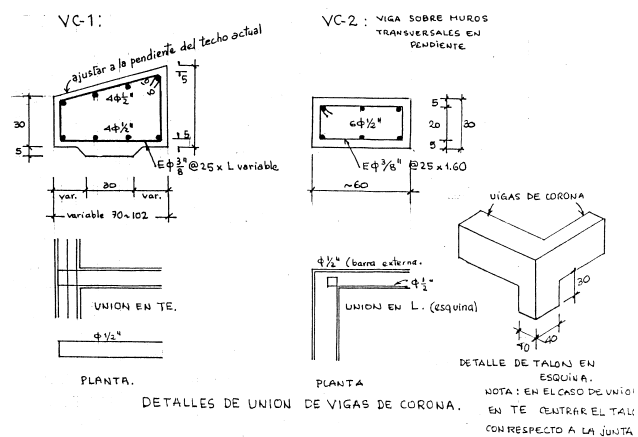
Frontis of Barinitas Church (R-2). Fig. 6. Details of crown connection beams (R-2).
